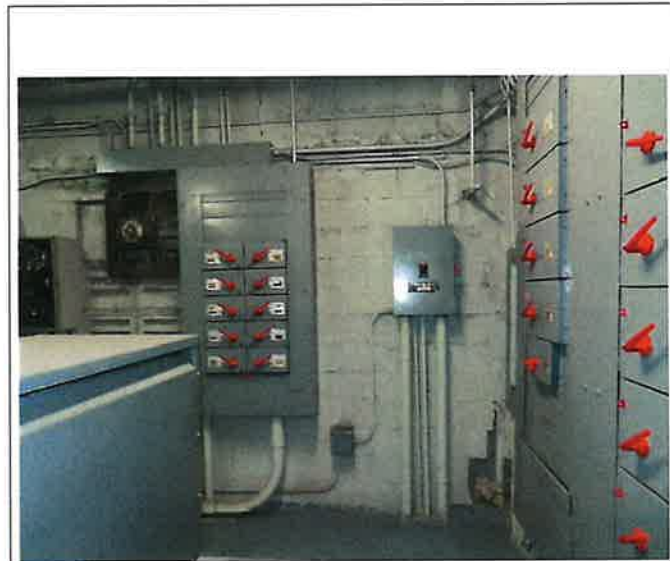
South building main electrical room electrical panel depicted (item #4.40)
